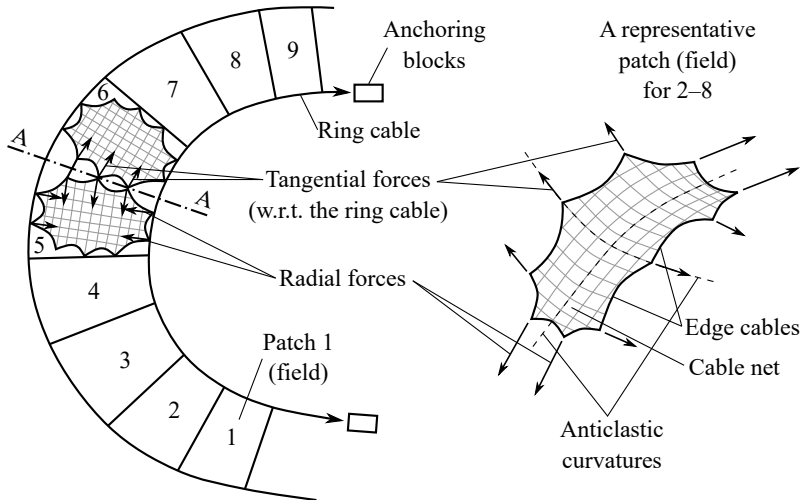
Overview of the roof structure, adapted from Leonhardt and Schlaich (1973).
